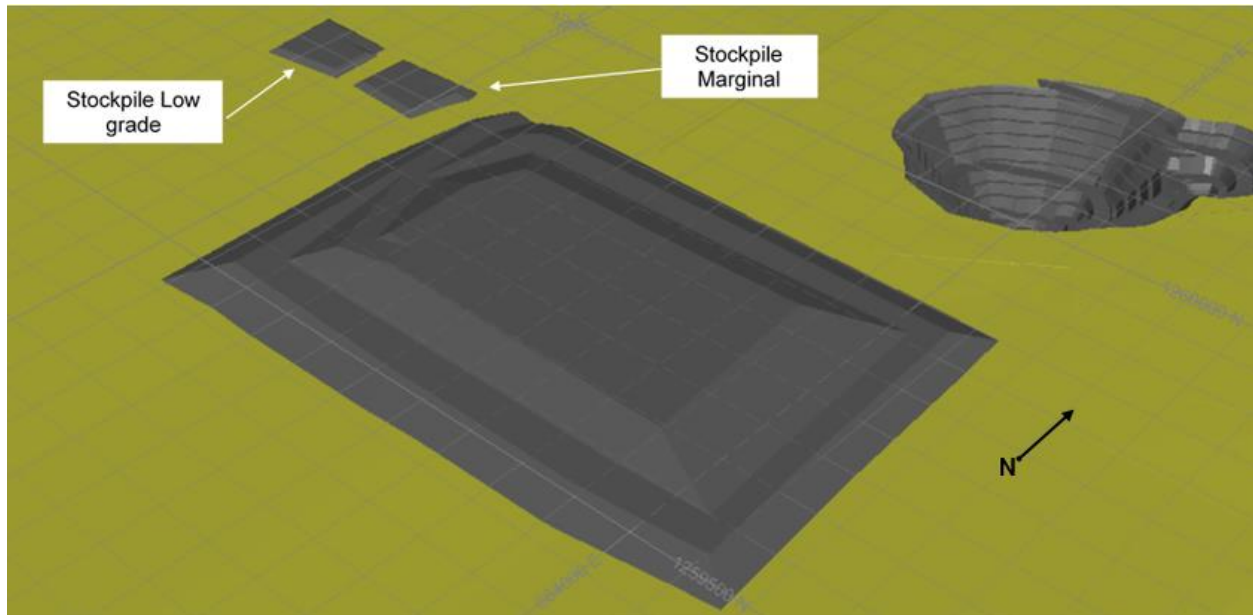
Waste Dump and Stockpiles relative to the Pit (view looking NW)
